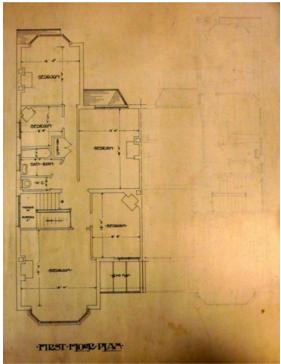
Semi-detached house floorplan type 2. The rear wings are on the outside, not on the shared wall. This example is from Laird's houses in Lewisham Park. A similar plan was also used by Watt in Eliot Park and Arran Road, for example.
